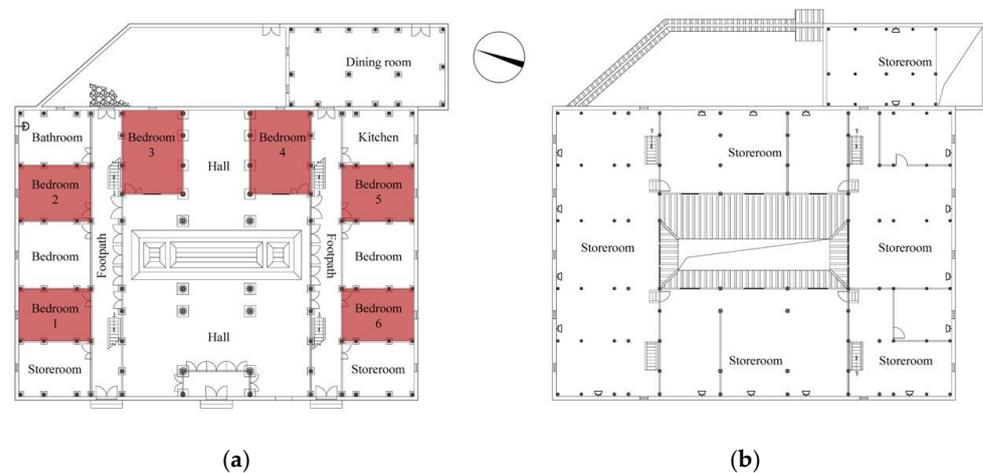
Planar graph of Rendetang. (a) First-story plan; (b) Second-story plan.
